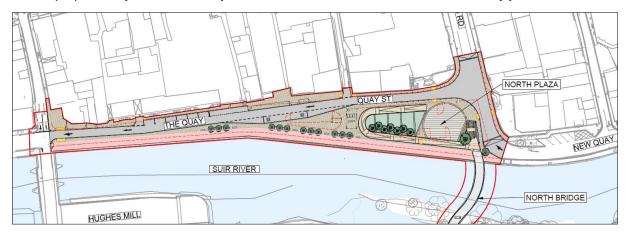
Proposed Quay Street/ Sarsfield Street Junction Layout
